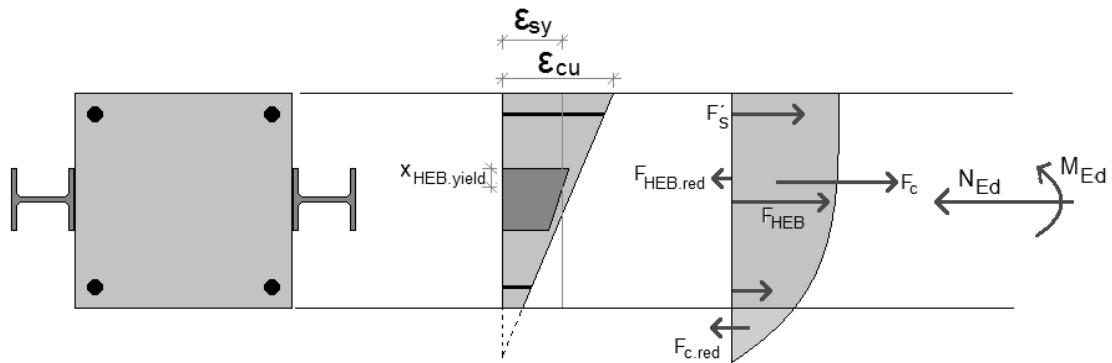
Model for sectional analysis of column section with vertically loaded steel profiles (without prestressing).
